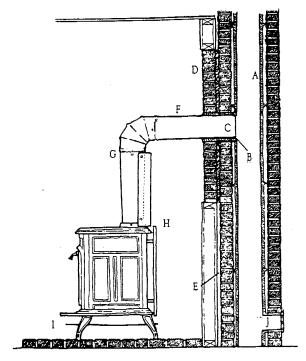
Installation into a Masonry Chimney through a Combustible Wall.
